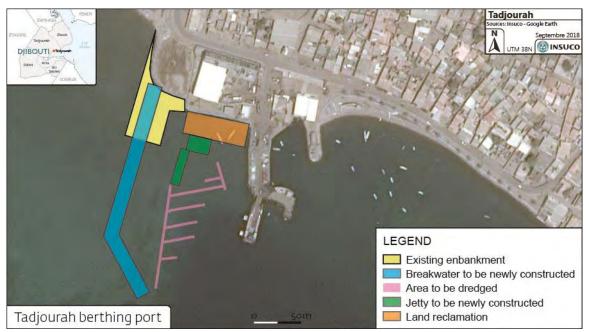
Existing and new infrastructures to be built in the port of Tadjourah
